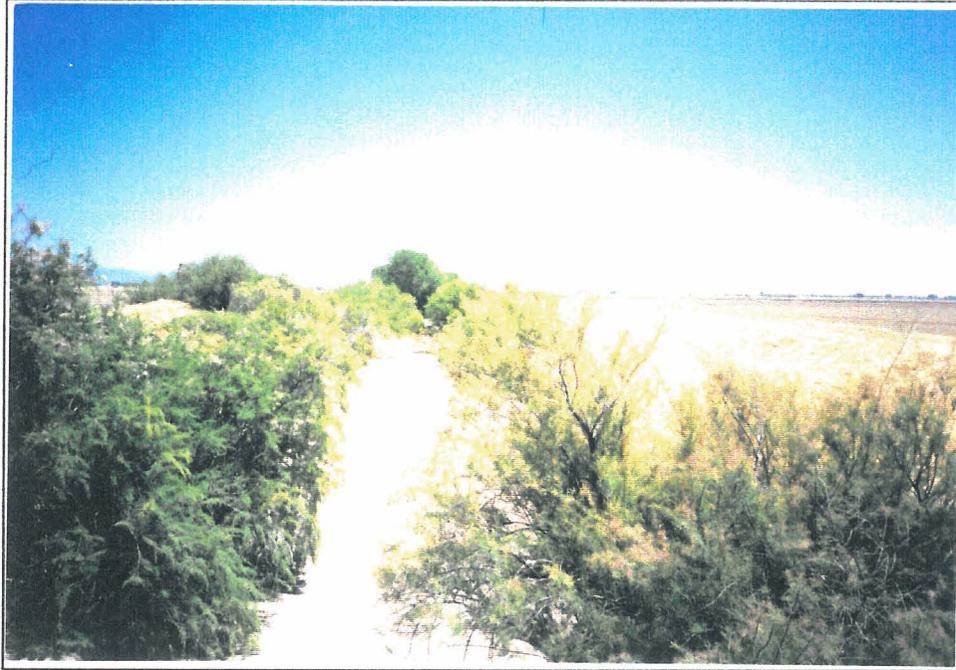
View looking upstream from approximately mid-span of structure. Note roughly trapezoidal cross-section and mature vegetation established at toe of levees. Also note relatively straight narrow sandy channel formed slightly south of centerline of levee crests. Upstream overbanks are generally cultivated fields.
